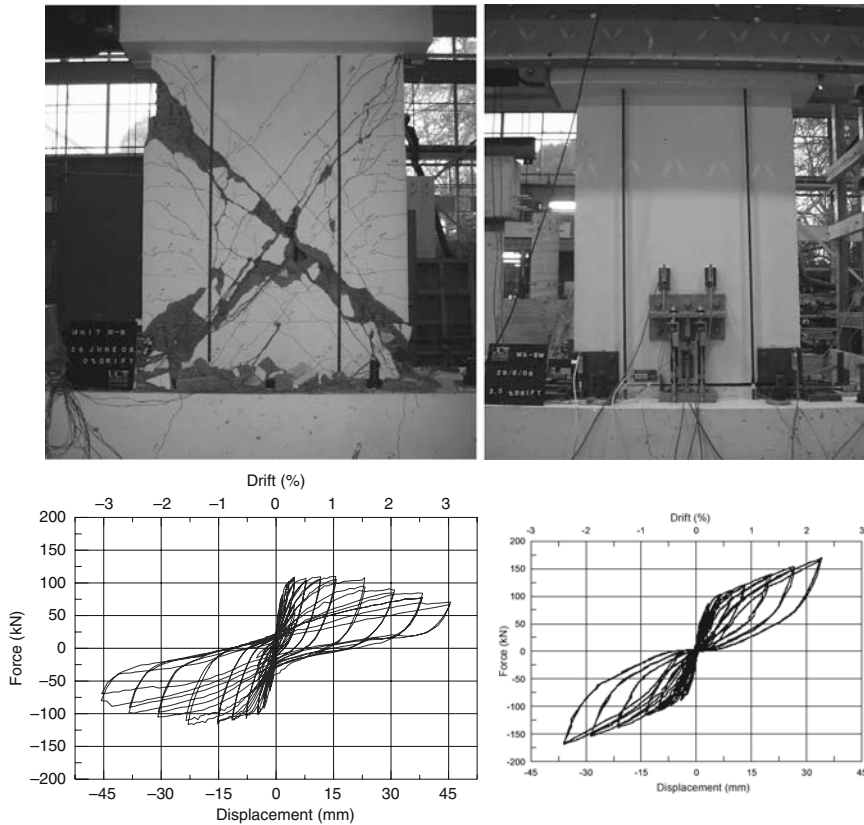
Typical shear failure mechanism in an existing under-designed RC wall and conceptual application of the proposed selective weakening technique (modified after [42])
